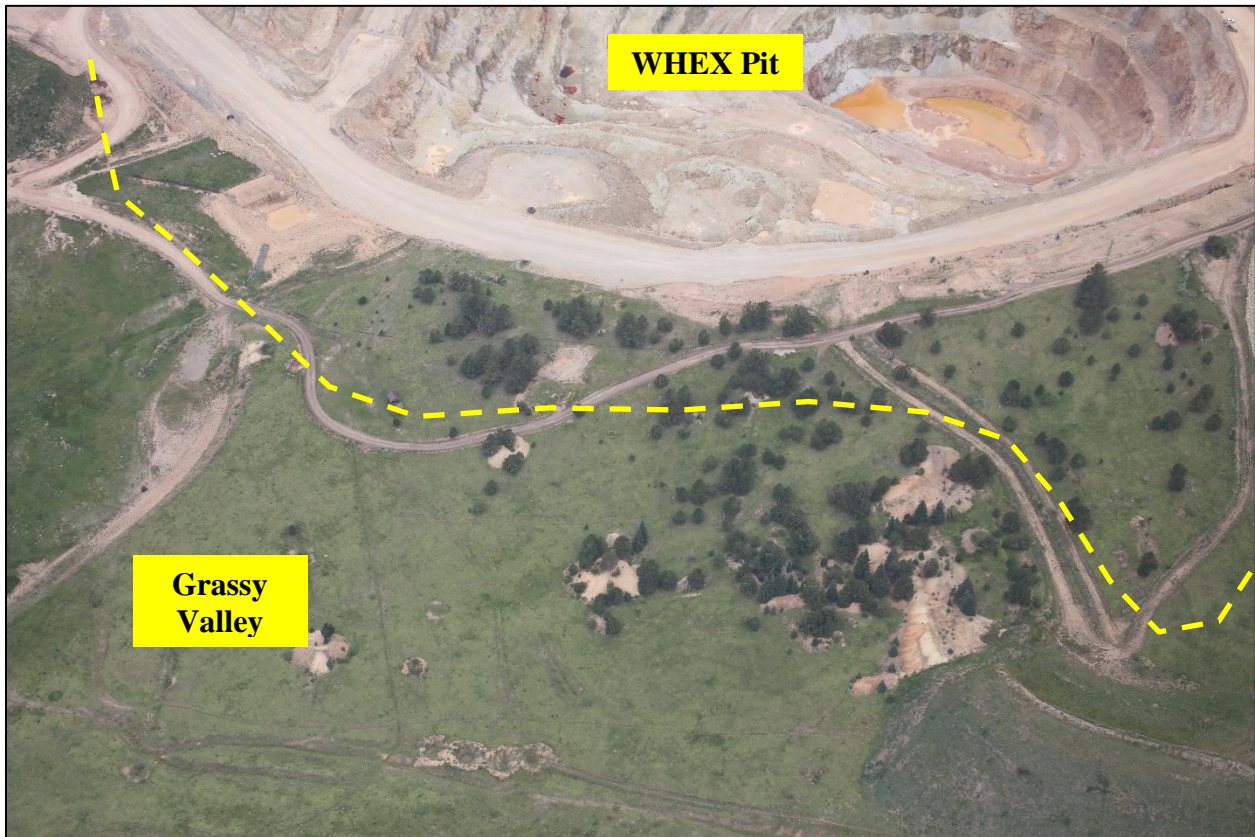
Area of proposed Ironclad Access Road relocation; looking southwest.
